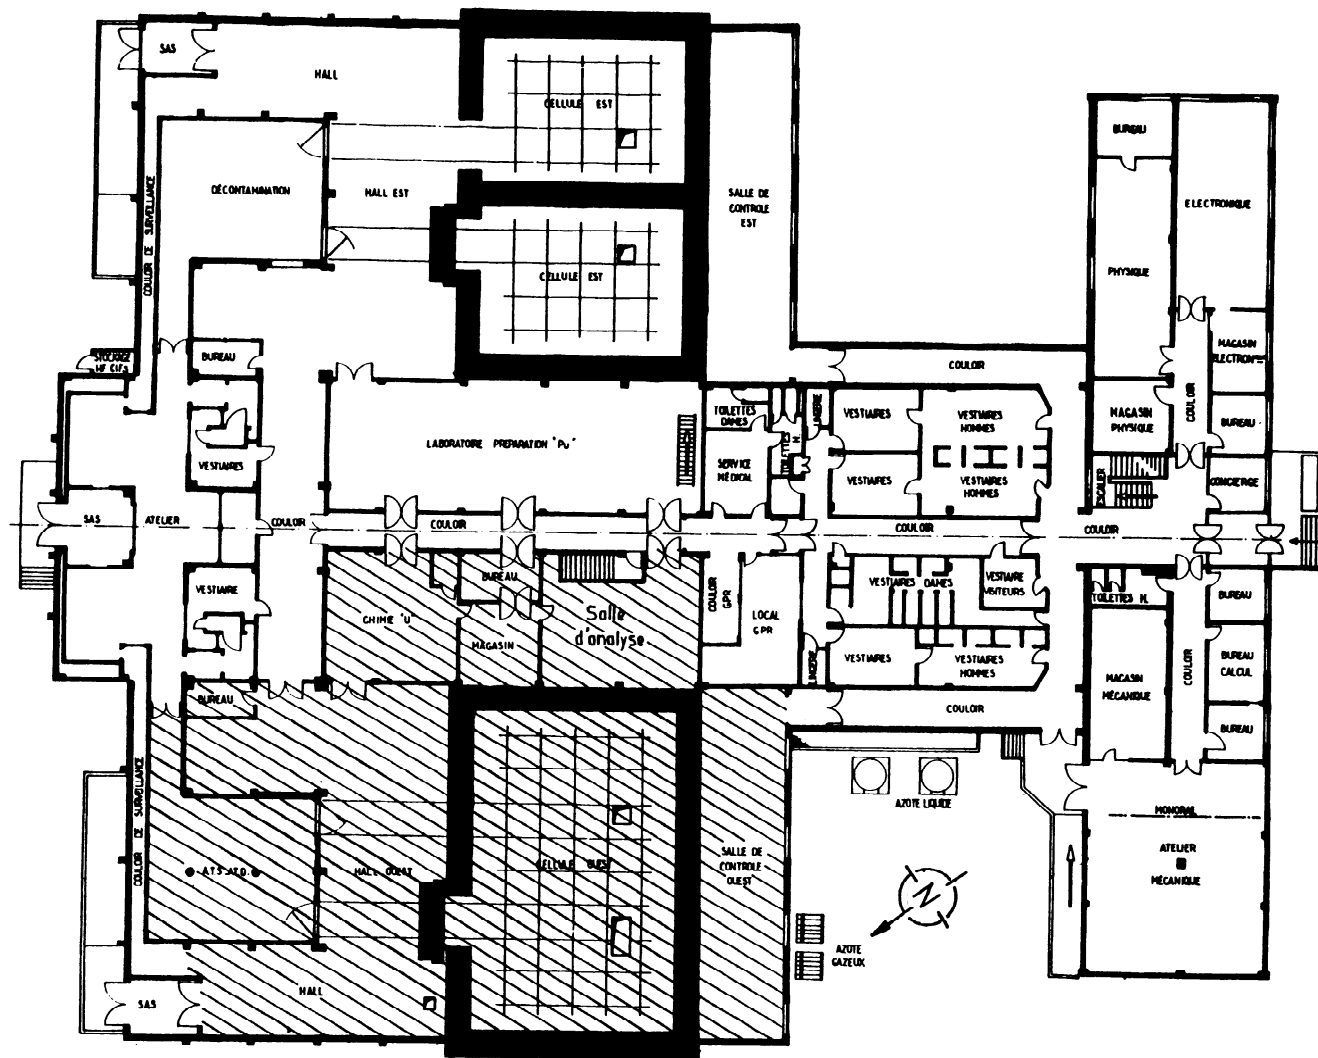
Plan of the Ground Floor of the Building in Which the Experiments were Performed.
